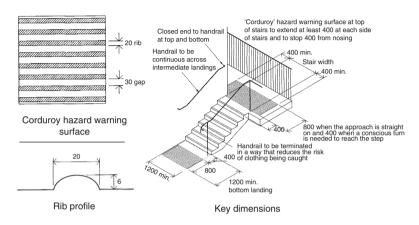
Stepped access – key dimensions and use of hazard warning surfaces
